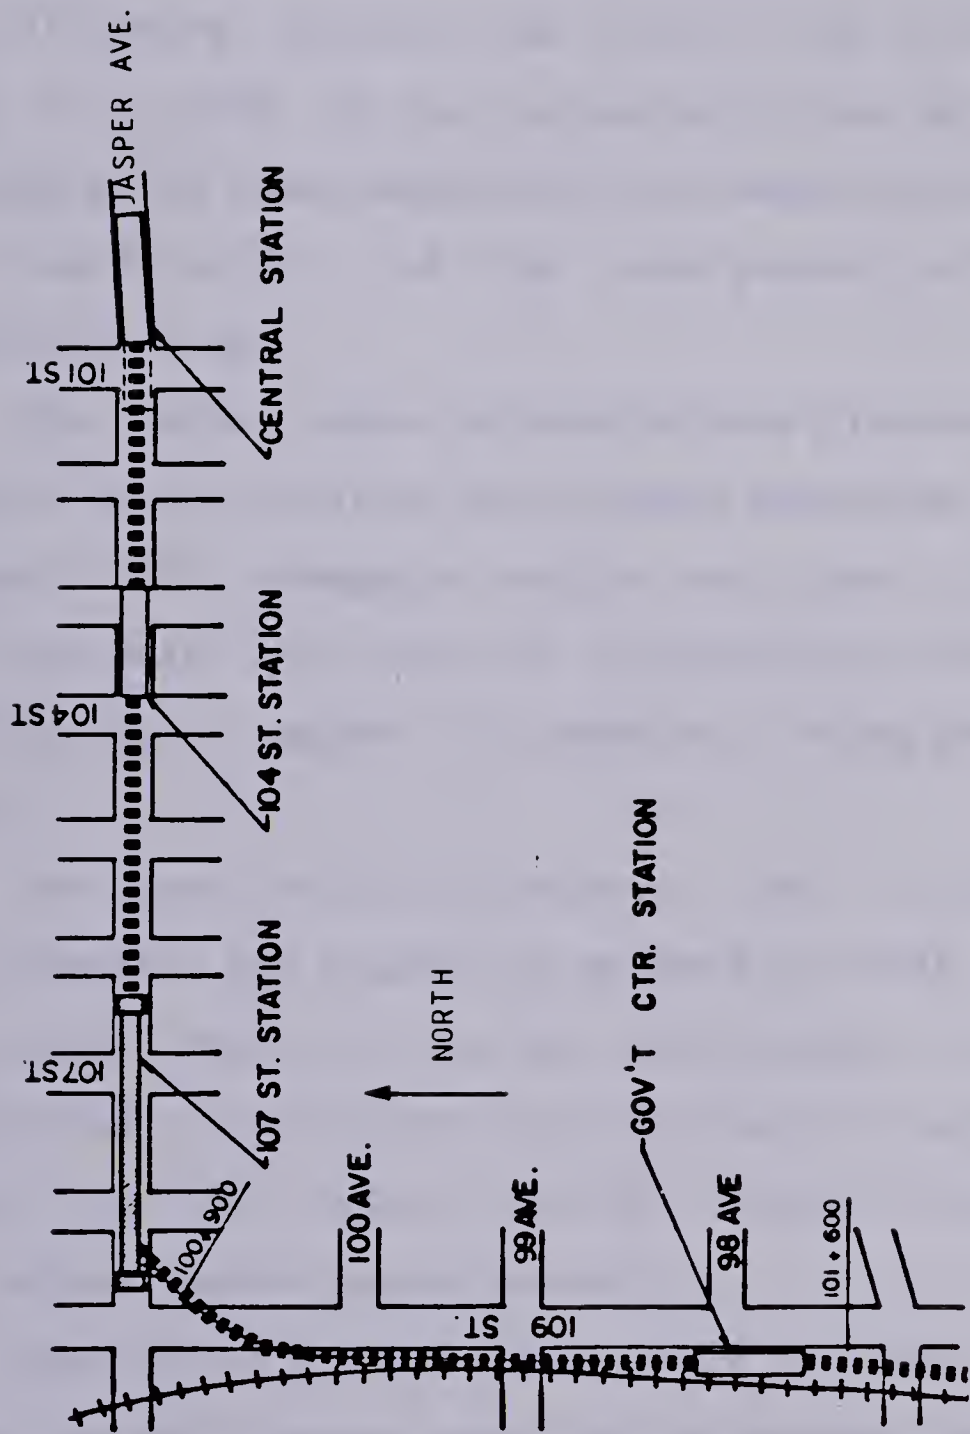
THE L.R.T. SOUTH EXTENSION - PLAN VIEW
